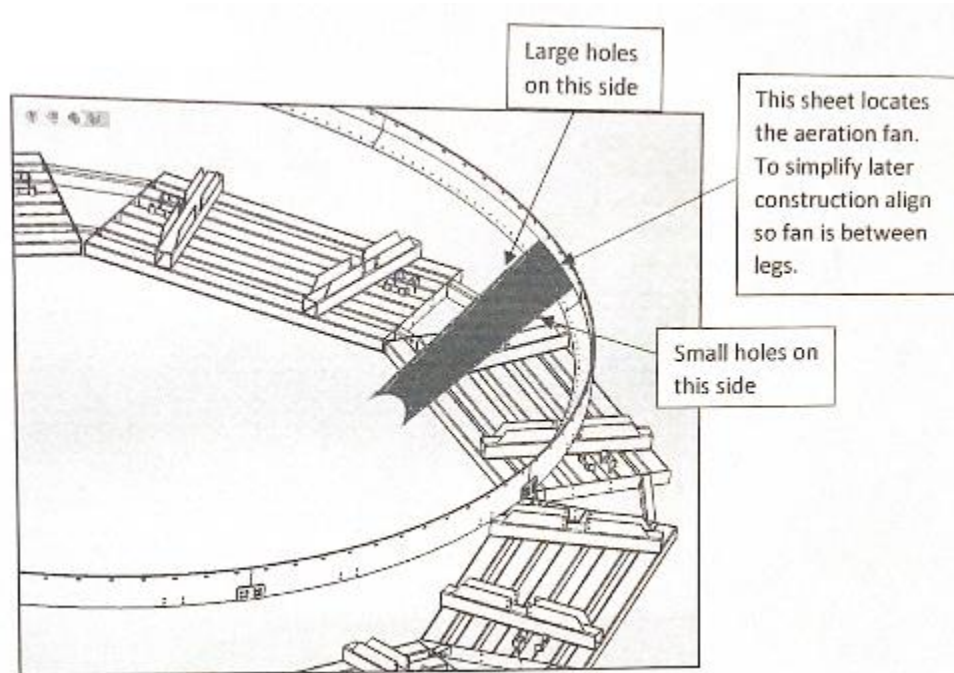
Raise ring and start installing upper cone sheets using supplied 3/8" fin head bolts
